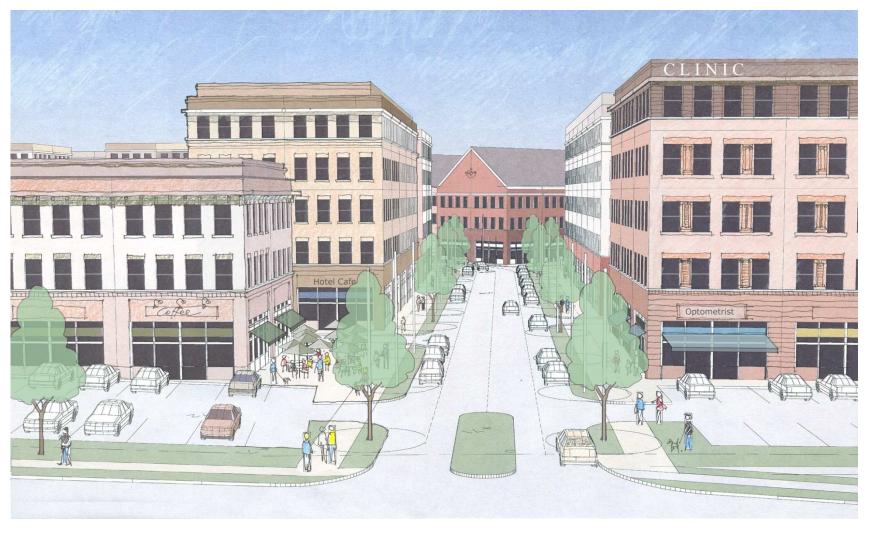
Perspective sketch showing proposed traditional architectural style, plus straight street segment with terminated view.
